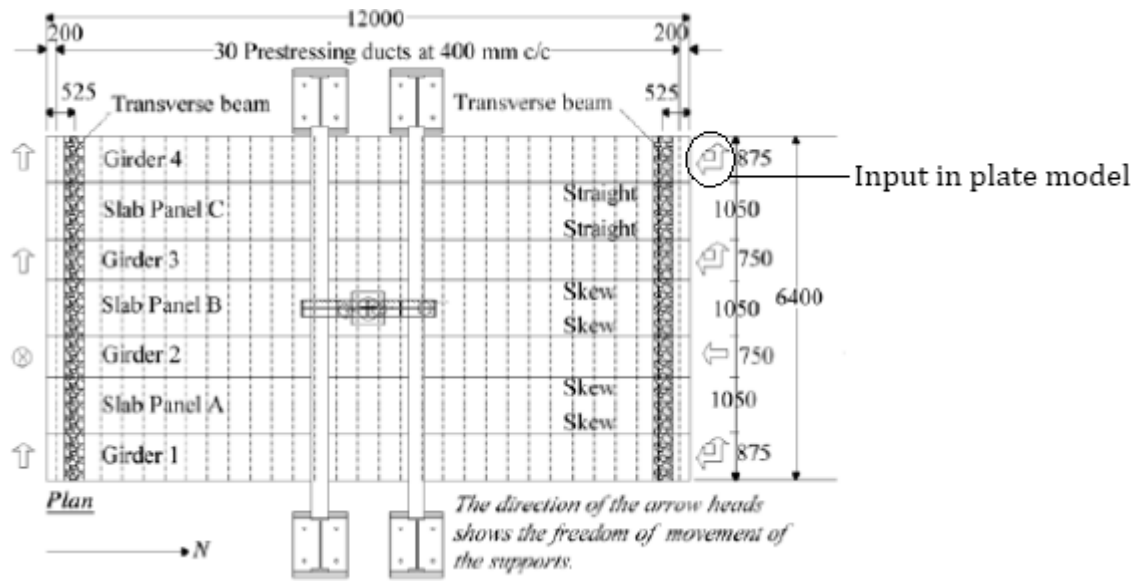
overview of test setup and geometrical data of girders and slab (Stevin Report No. 25.5.13-06, 2013)
